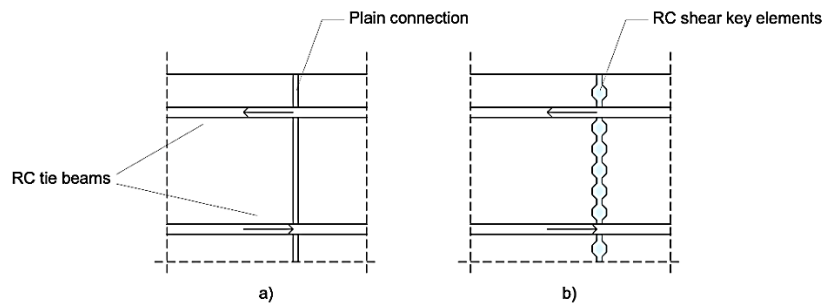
Vertical joints between adjacent wall panels: a) unreinforced shear keys and RC tie-beams at floor levels, JU-59 and JU-60 variants [24] and b) reinforced concrete shear keys, JU-61 and later variants [21]
